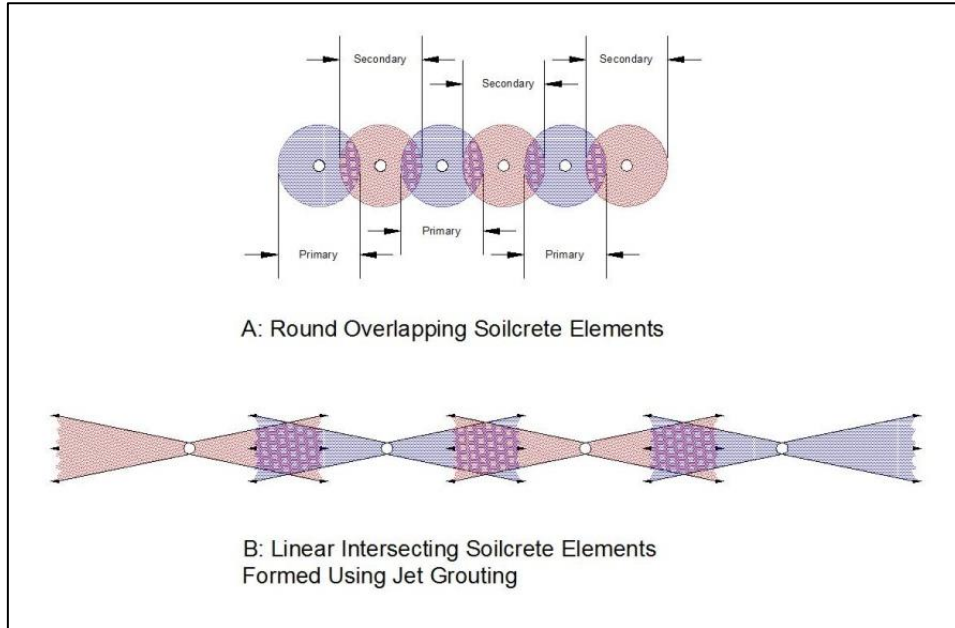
Types of jet grout cutoff walls – general plan view.
